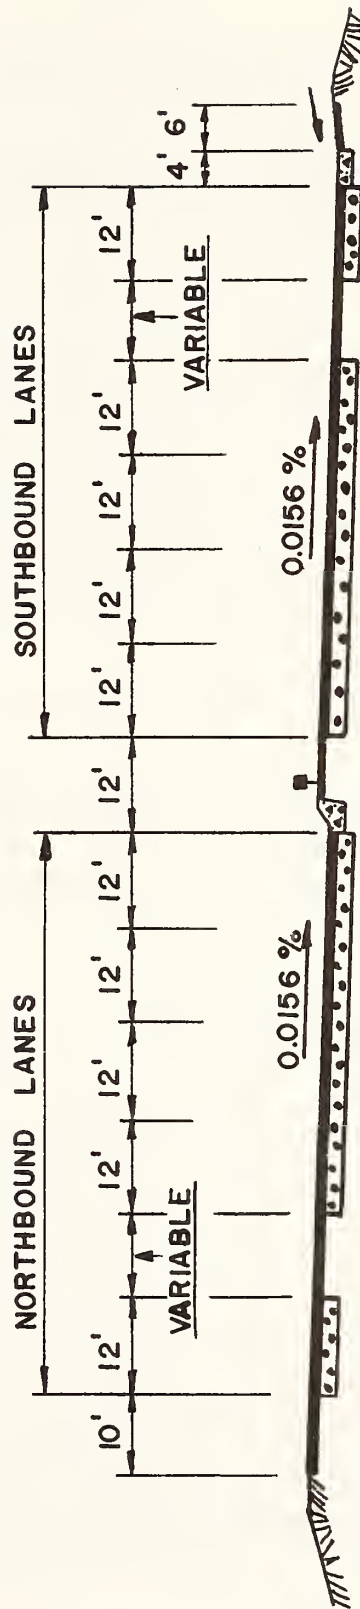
Schematic drainage plan, I-25 site, Denver, CO
